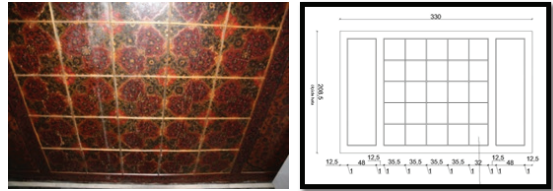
and Drawing 3: Hand-drawn ornament on wood on the ceiling and the drawing
